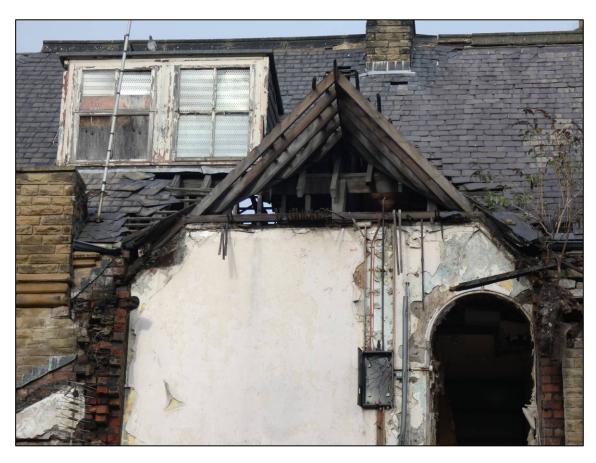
South elevation after demolition, former two storey part of service wing, attic, looking N (photo 2/198).
